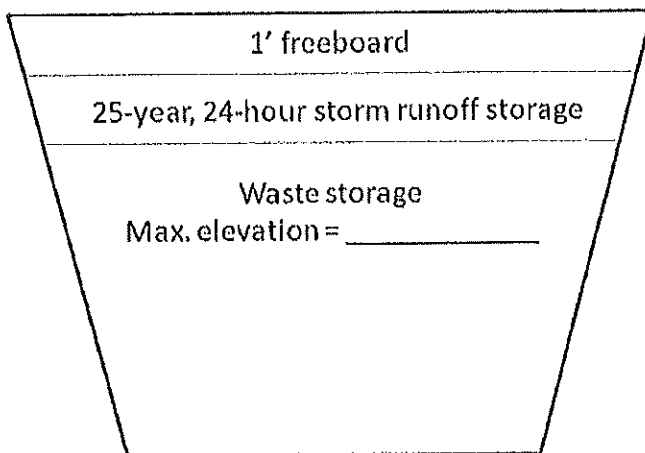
Pond or pit storage components and maximum waste storage elevation.
